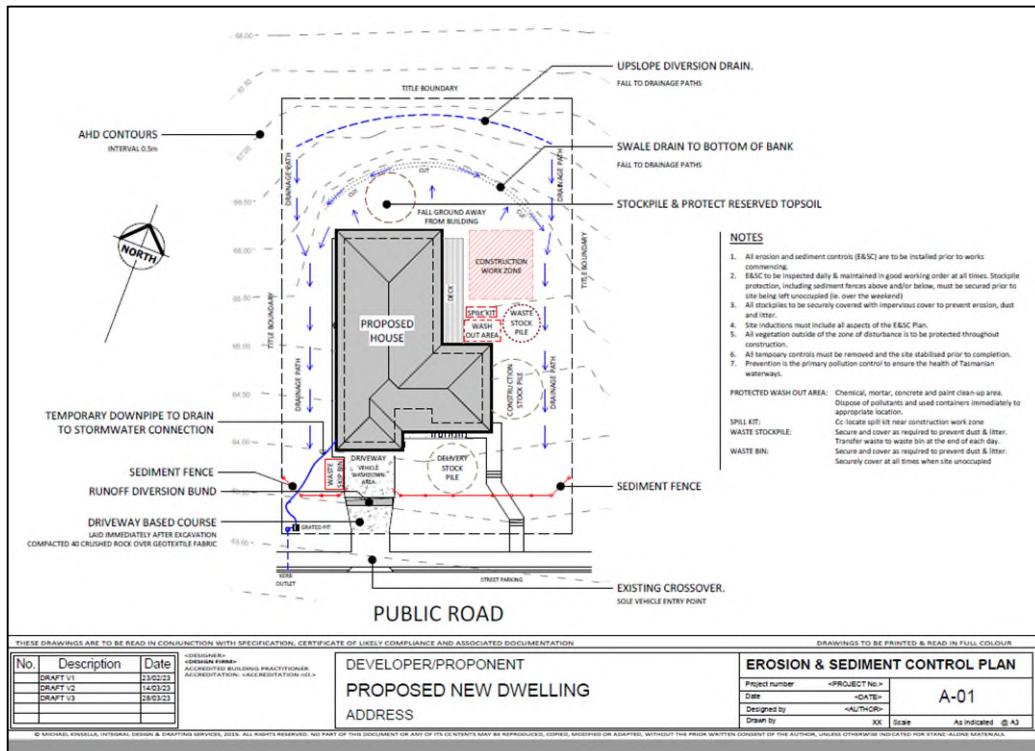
Example of a site drawing detailing the slope of the ground, site drainage patterns, and the location and type of ESC measures to be installed. Image source: TEER & DEP, 2023
